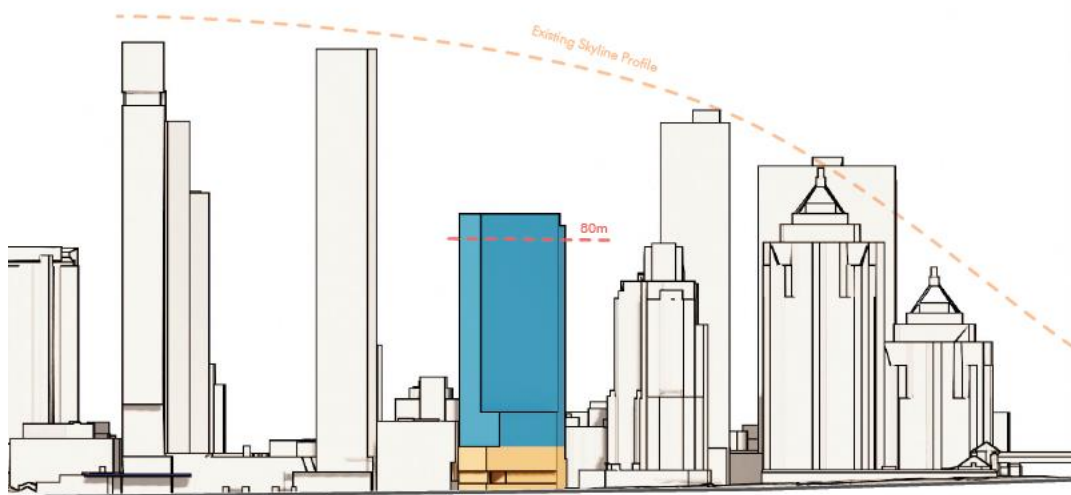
Existing Skyline profile - Victoria Avenue Elevation
